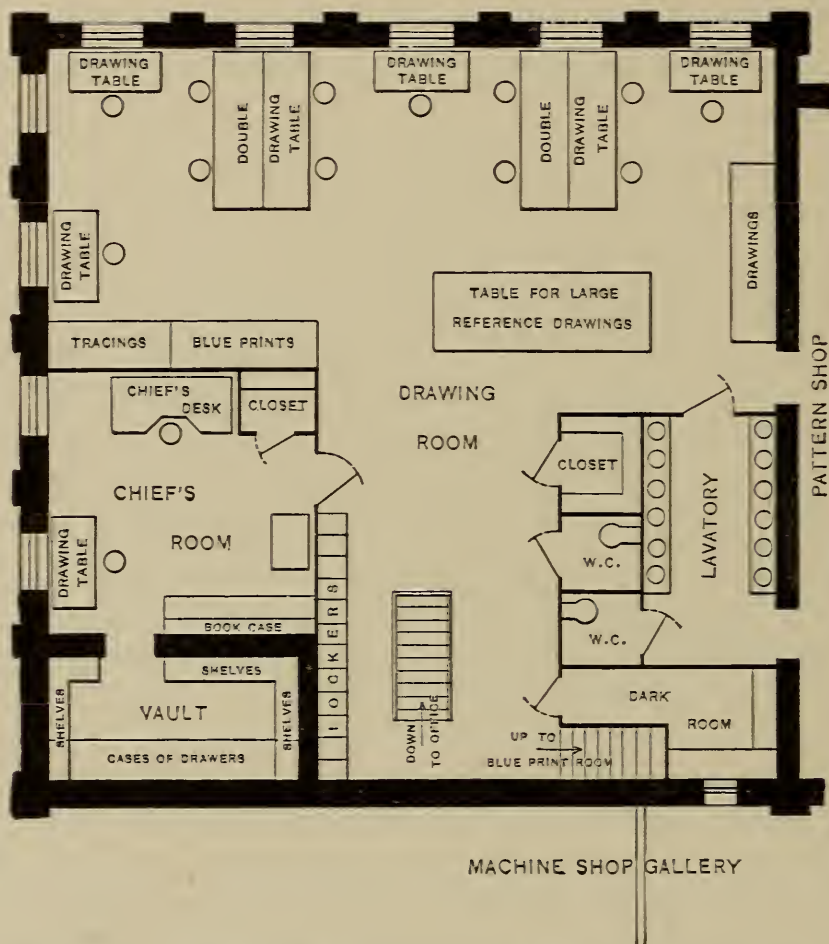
Drawing Room Arranged for Storage Vault in one Corner
